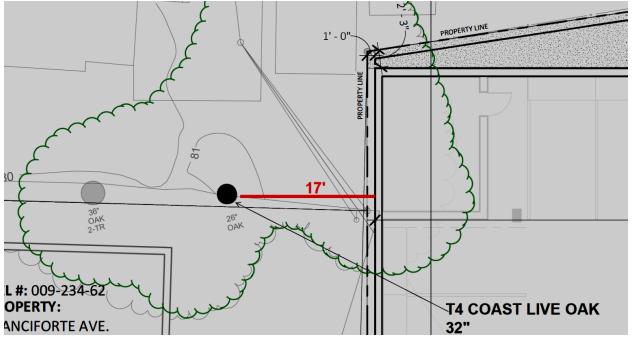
Tree T4, coast live oak, and distance to building foundation.
